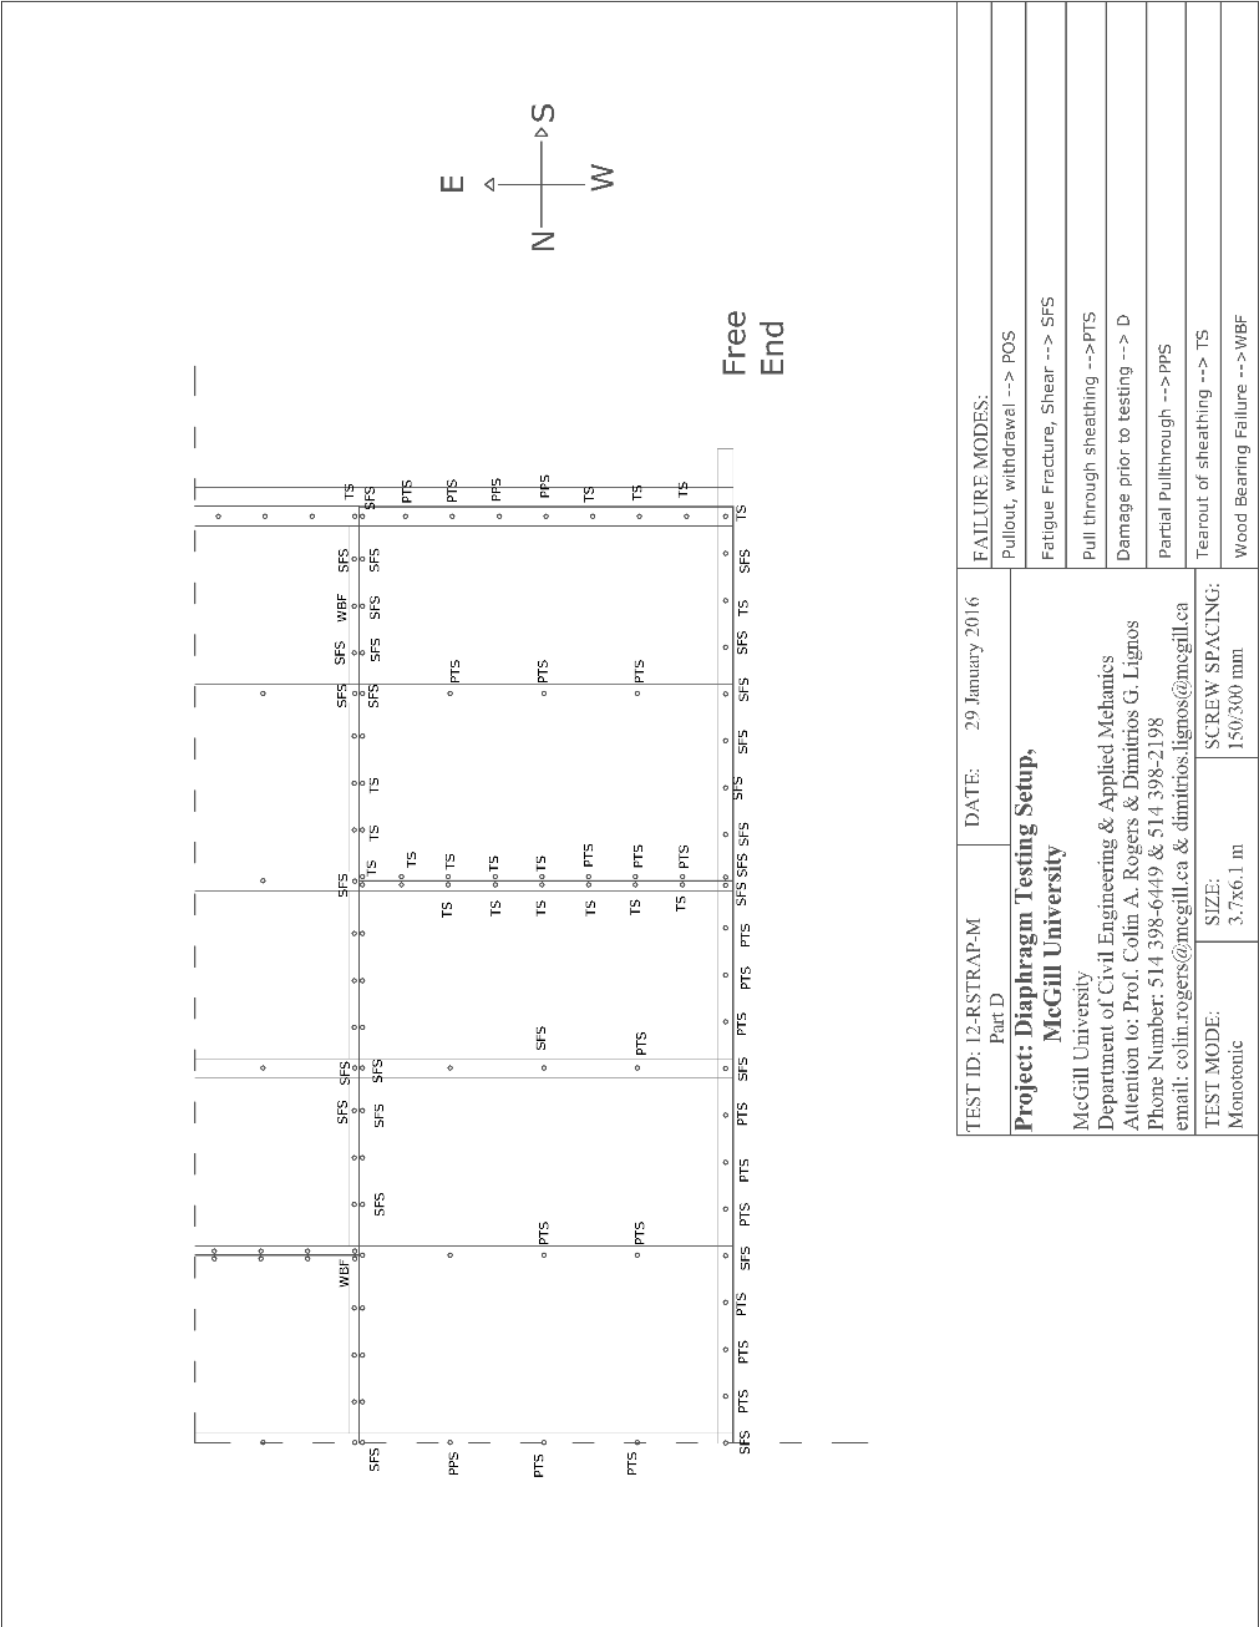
Sheathing Fastener Failure Modes Part D Specimen 12-RSTRAP-M
